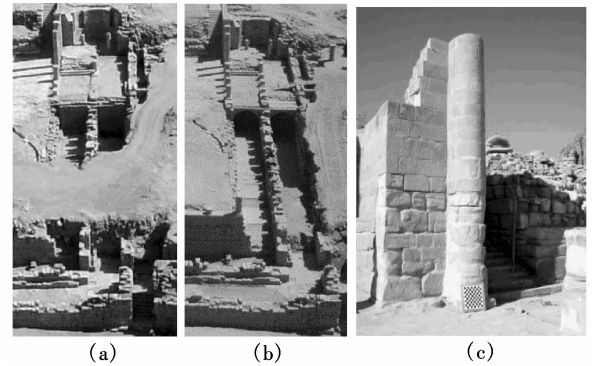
Lower Temenos. (a) Lower Temenos West Cryptoporticus before excavation and reconstruction; (b) Lower Temenos West Cryptoporticus after excavation and reconstruction; (c) The East Exedra Engaged Column, re-erected
